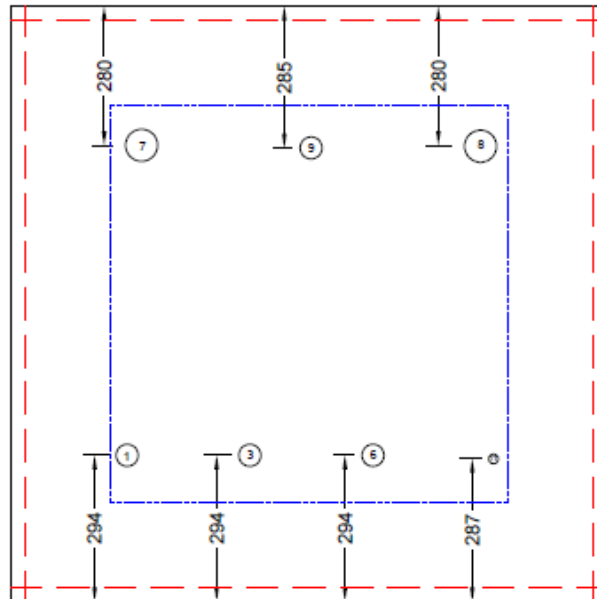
Test 1 – Elevation – Aperture Location Fire Side – Horizontal.pdf
